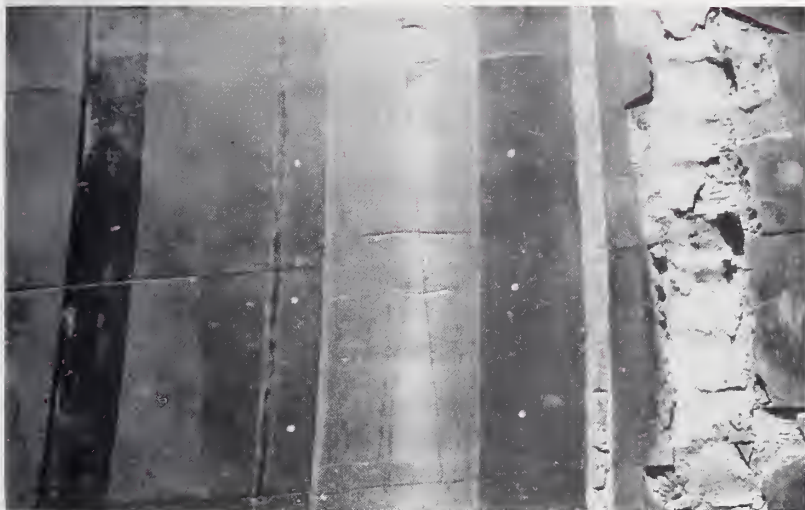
$\frac{1}{8}$ -in. asphalt tile, asphalt type, on wood sub-floor (test panel 18R).
